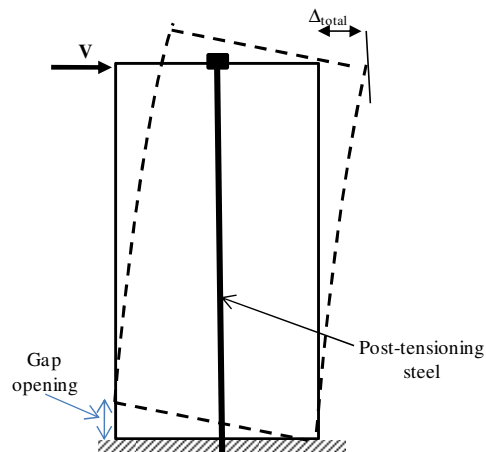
Gap opening at the base of the wall in unbonded post-tensioned precast wall systems
